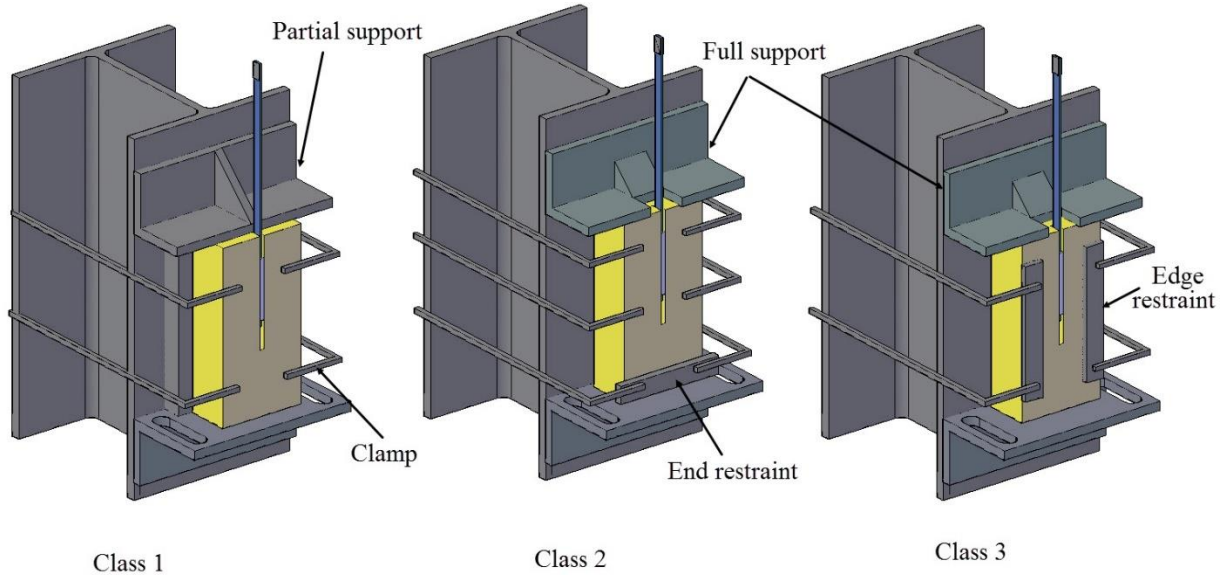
Geometry of the test specimens and the test setup (dimensions are in mm).
